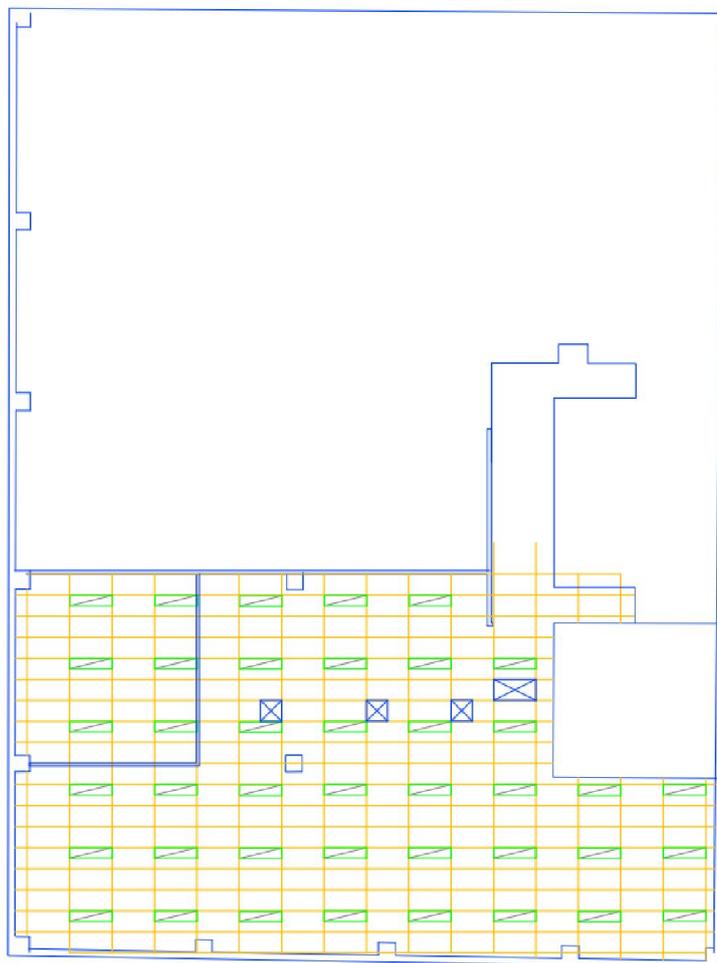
Reflected ceiling plan for the case study tenancy at L5, 134 William St, Woolloomooloo.
